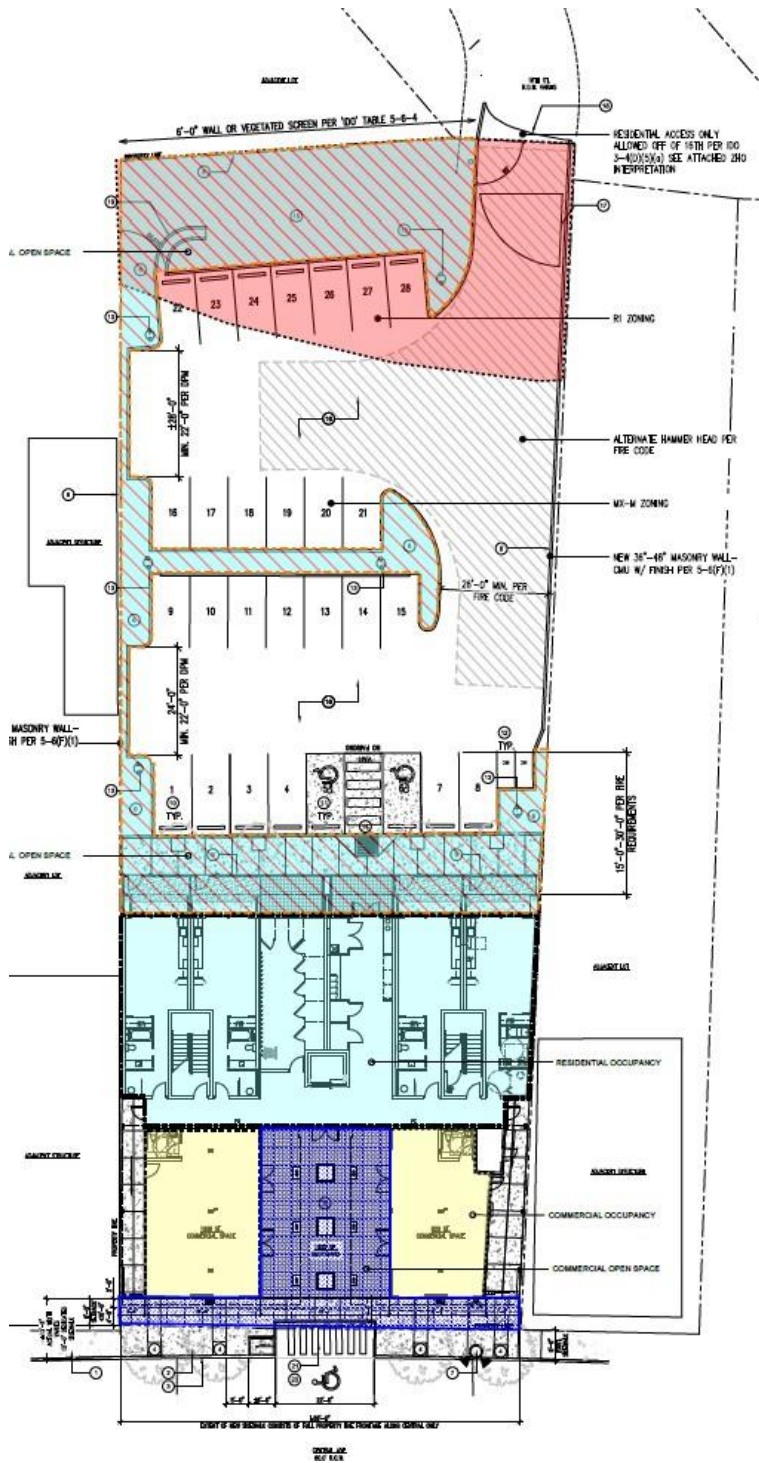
The Pearl, mixed-use development, approved Site Plan.
